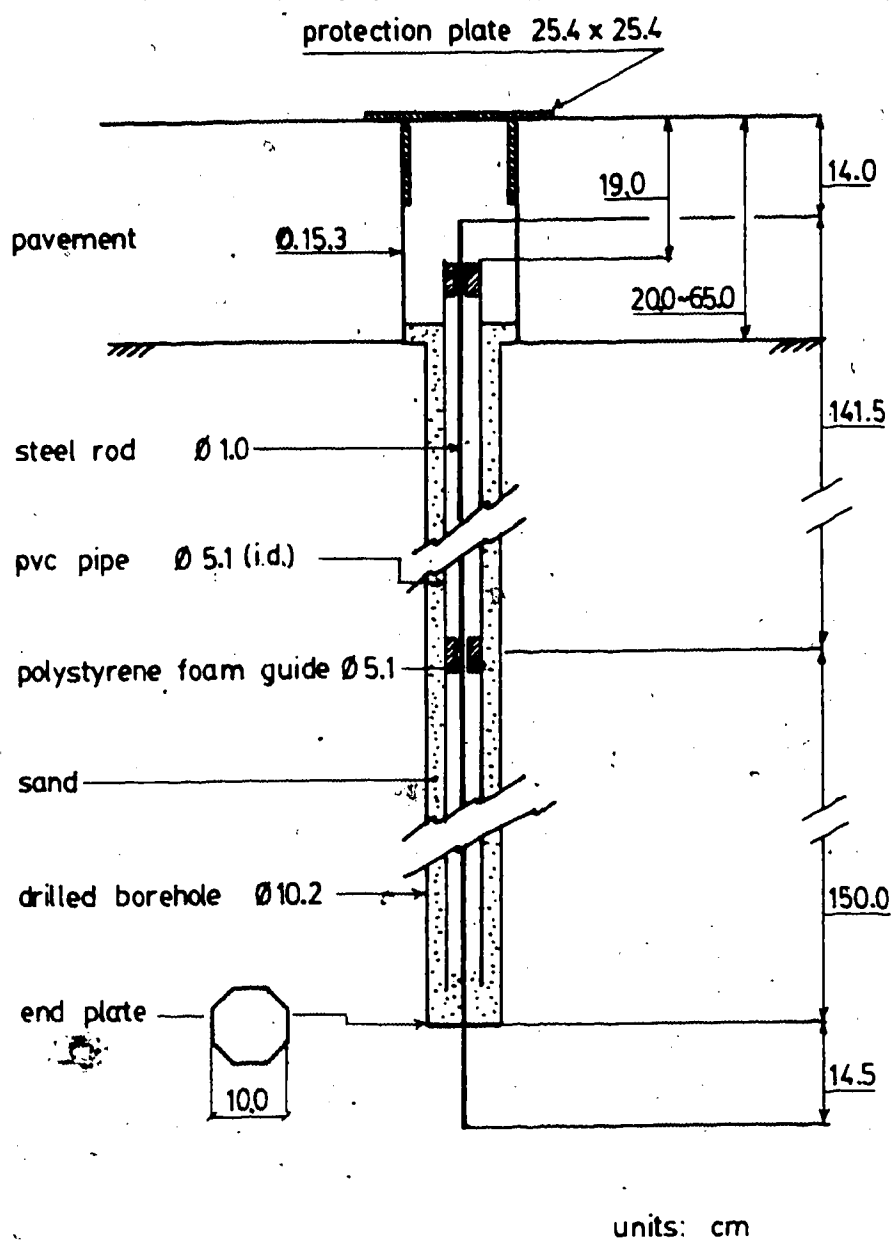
SETTLEMENT POINT - DESIGN DETAILS
